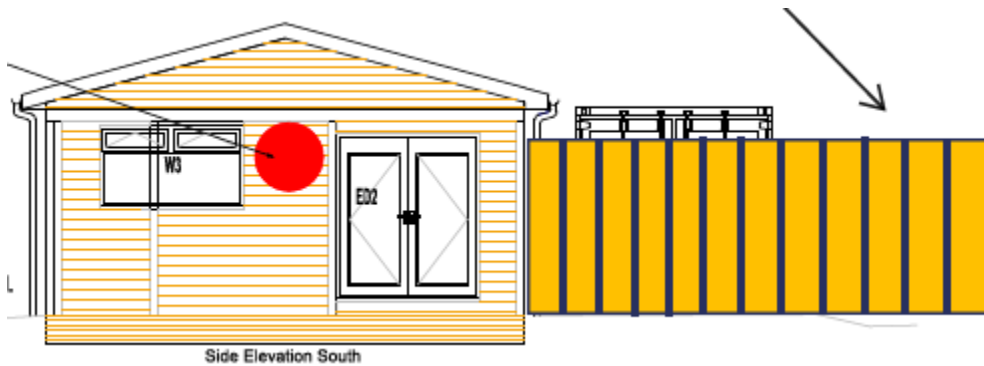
Southern elevation of container and fencing in context with adjacent approved bike hub.
